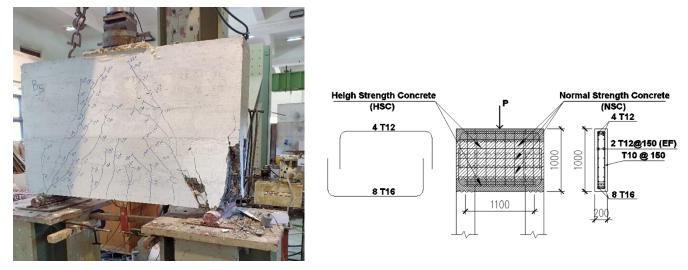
Crack pattern and failure mode for specimen (B5) 4.2Experimental Failure Load
